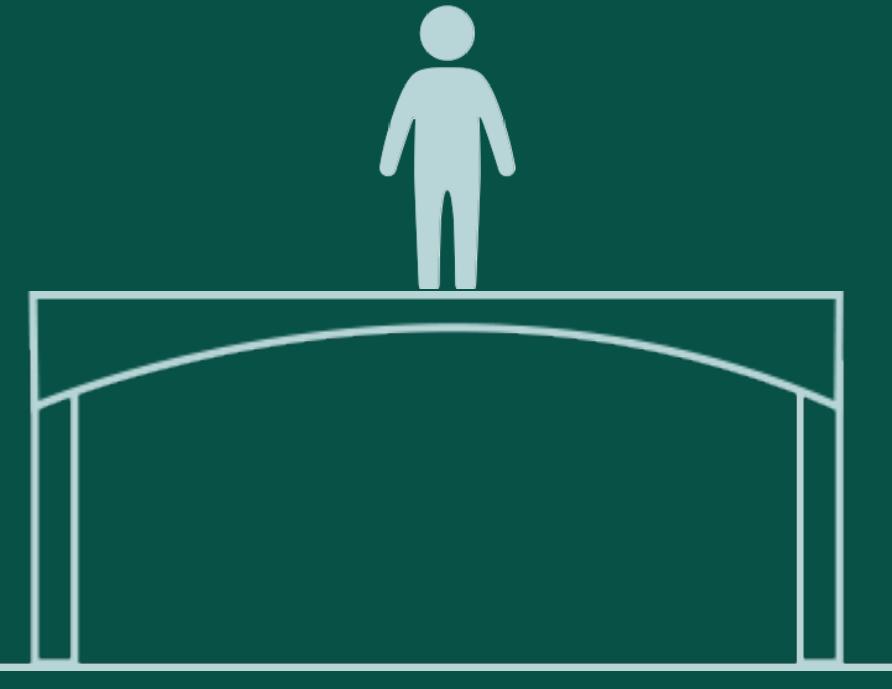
Catalan vault floor slab at SUDU project, Ethiopia, with lightweight stiffening walls and compacted fill. Image retrieved from López López, D., Van Mele, T., & Block, P. (2016). Tile vaulting in the 21st century. *Informes de La Construcción*, 68(544), 162. <https://doi.org/10.3989/ic.15.169.m15>
